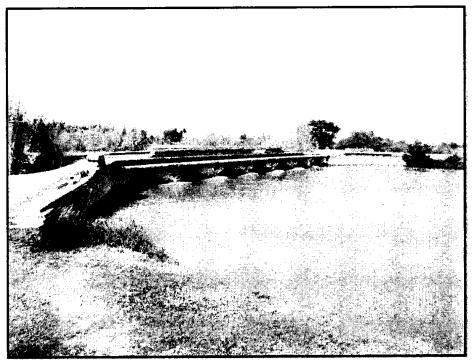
Village Road Bridge at RD 219+000 - Upstream View
